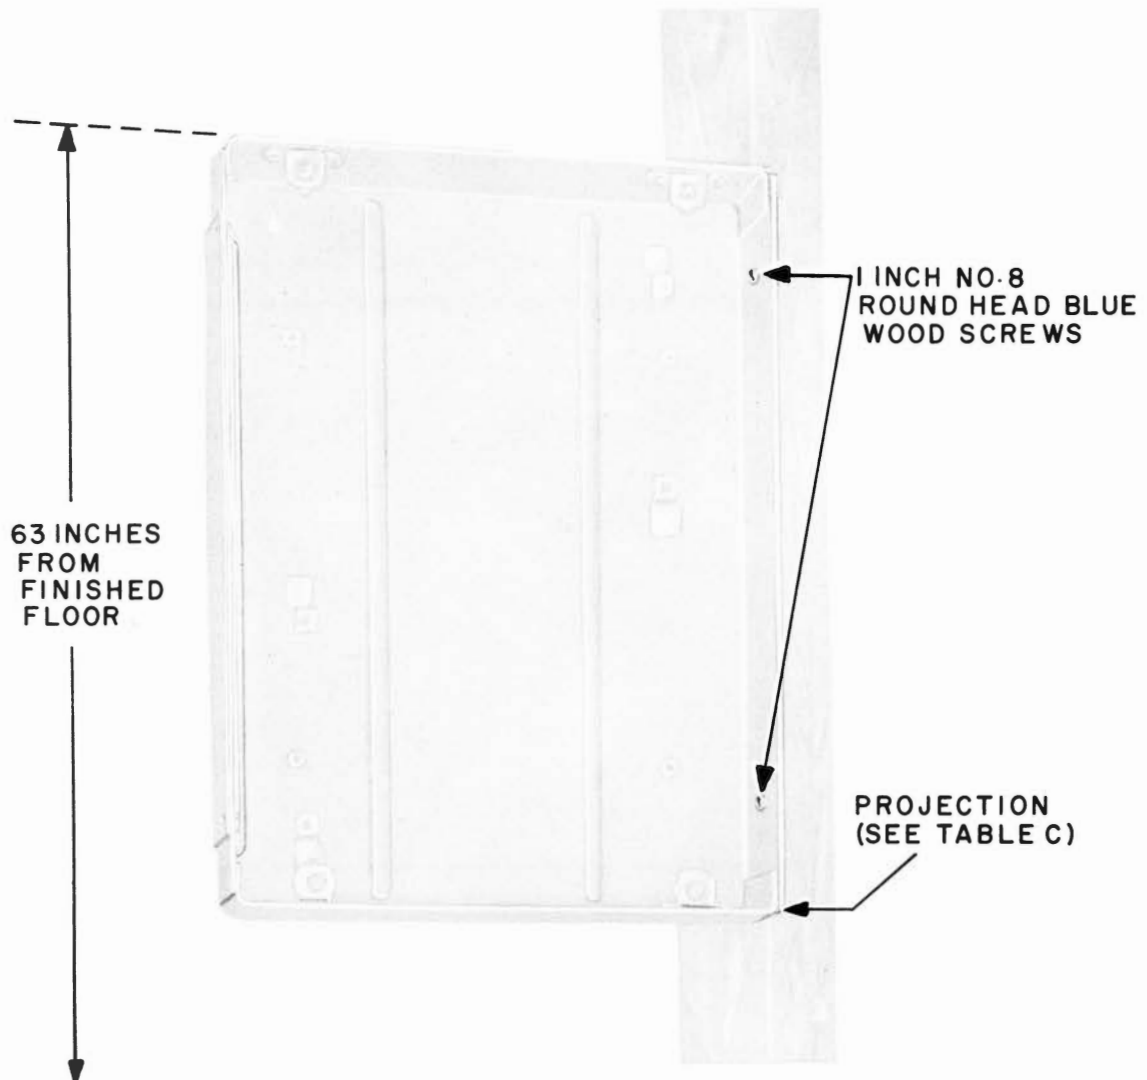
113-Type Apparatus Box Mounted on Wall Stud
